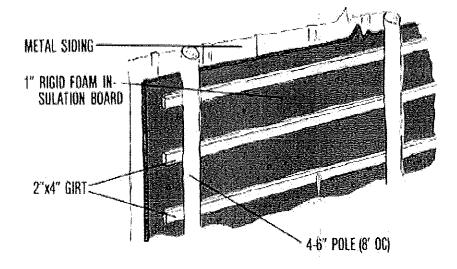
Post wall with rigid foam insulation (R=4-8). Post wall with rigid foam insulation is used in livestock buildings where it can be protected from animal contact. Check with your insurance company about fire hazards from exposed insulation.
